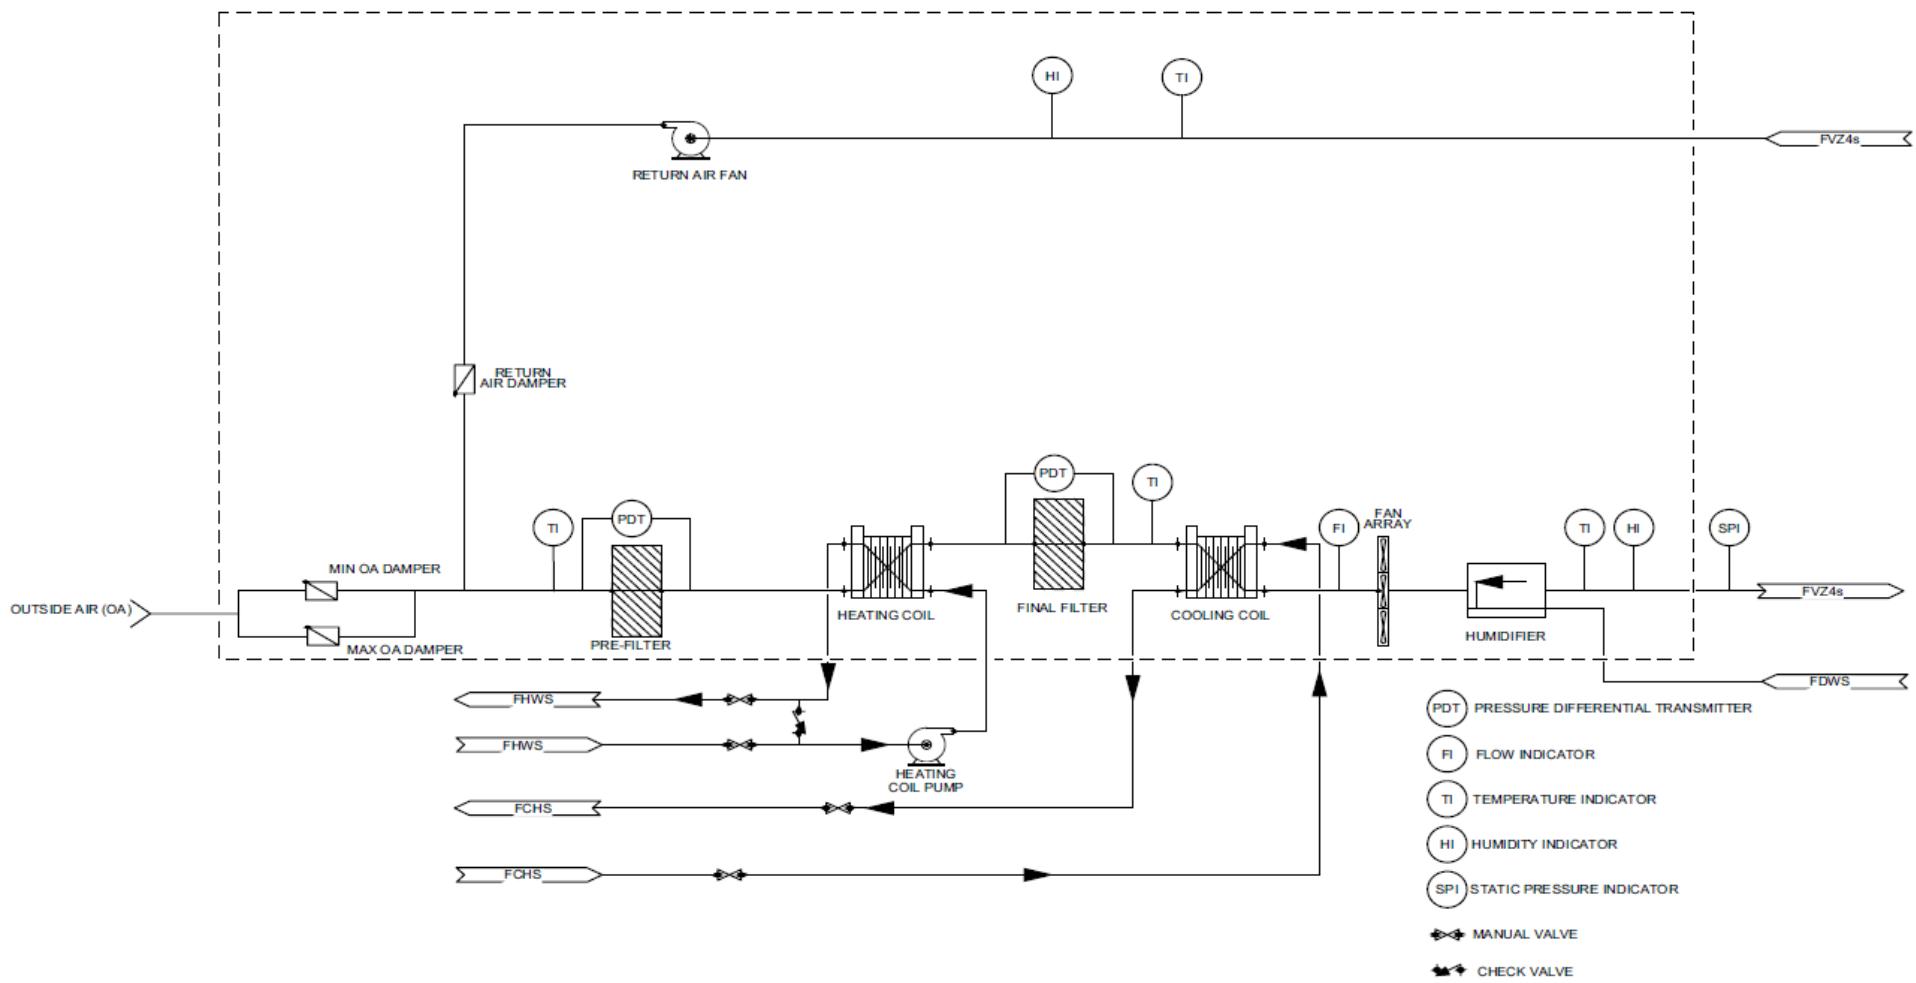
2.1-11 – Facility Ventilation Zone 4 (FVZ4) Air Handling Units (AHUs) (Typical)
